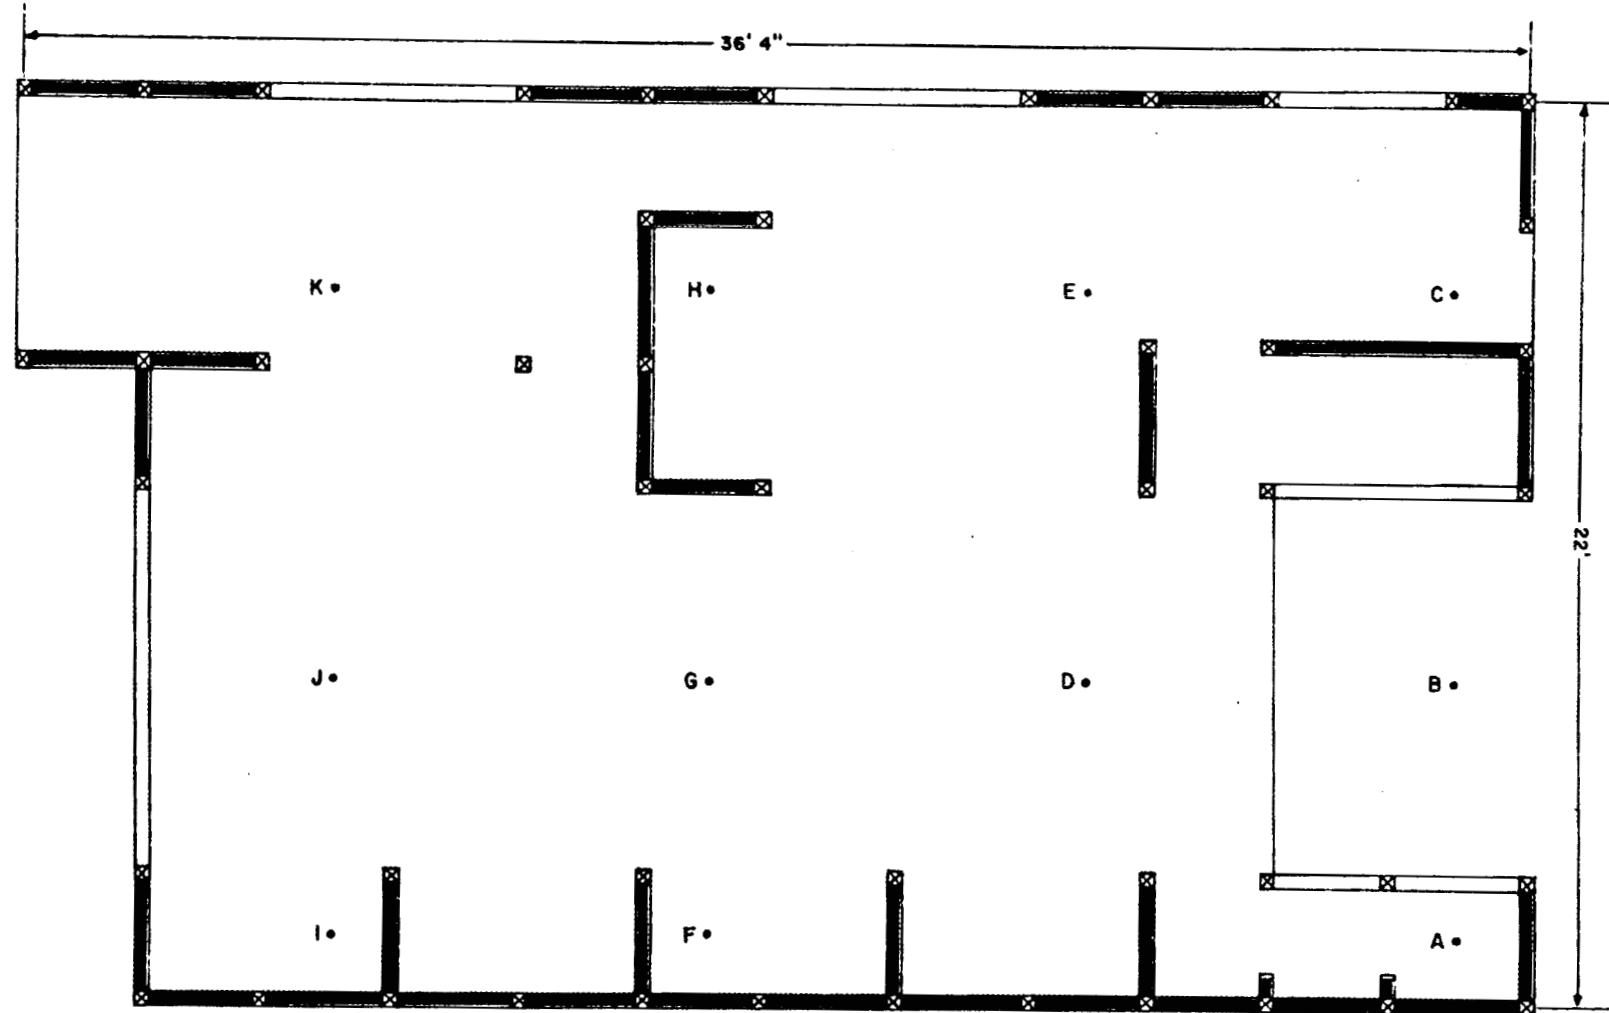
Floor Plan of BREN Type B House, First Floor
